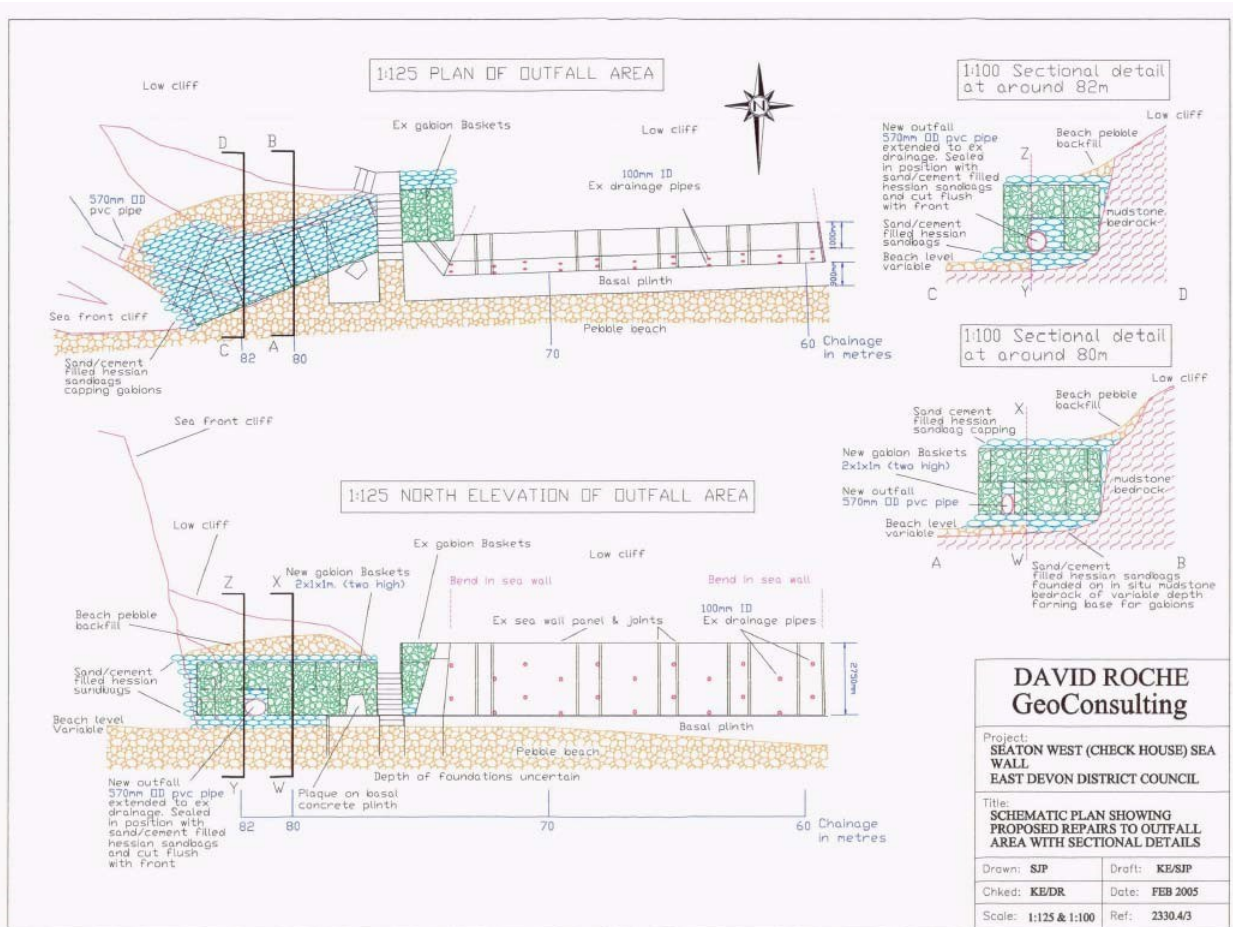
Schematic plan showing proposed repairs to the outfall area with sectional details
